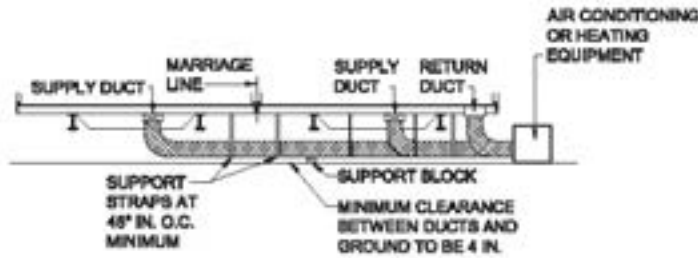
Ducts connecting exterior heating and/or cooling equipment to the home
